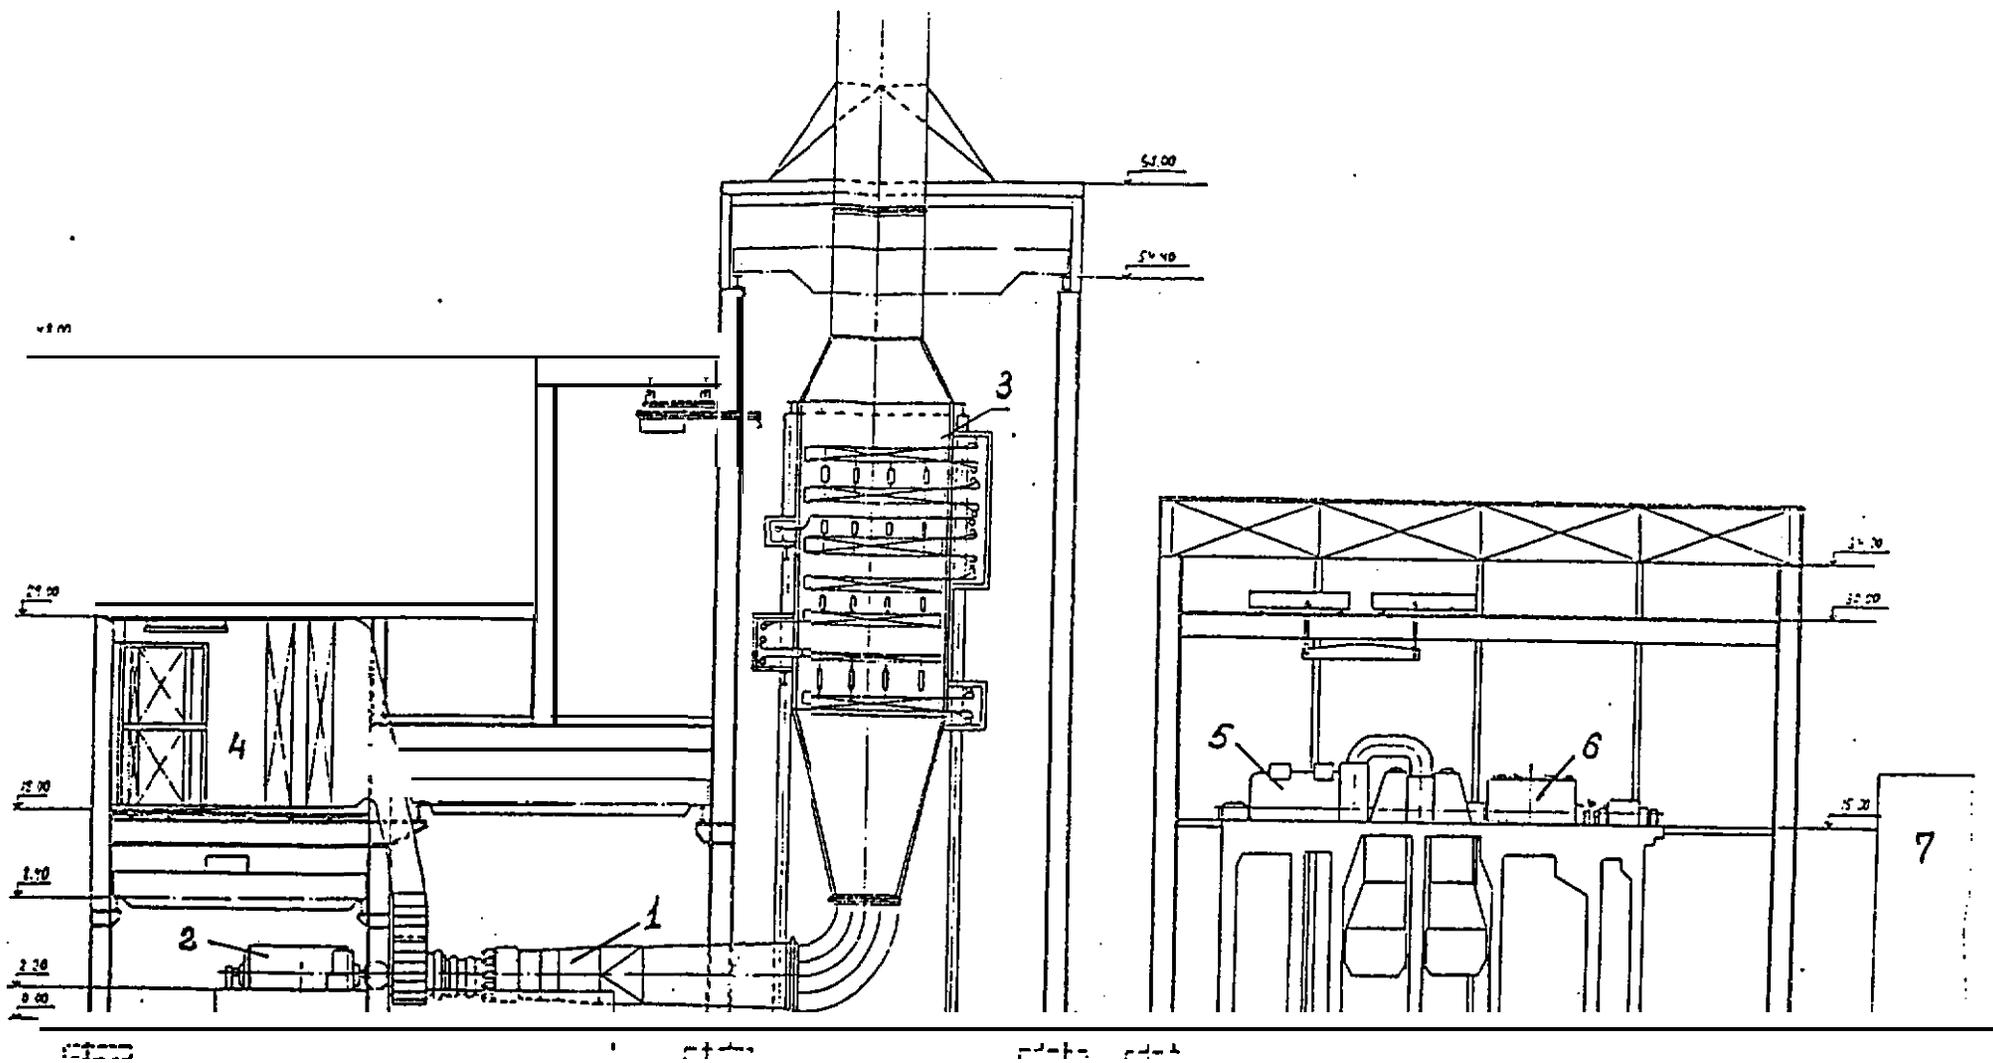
Cross-section of the Main Building for Power Part of GCC Plant
